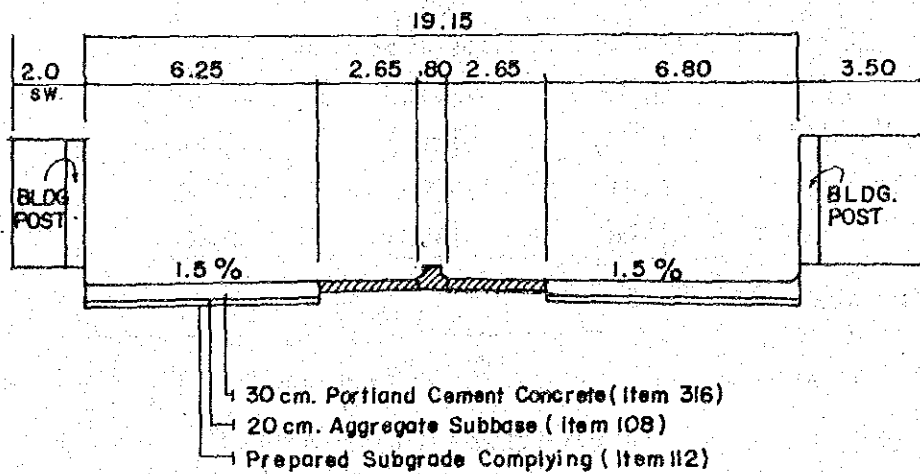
PROPOSED IMPROVEMENT: URBAN SECTION OF SAN JOSE CITY
